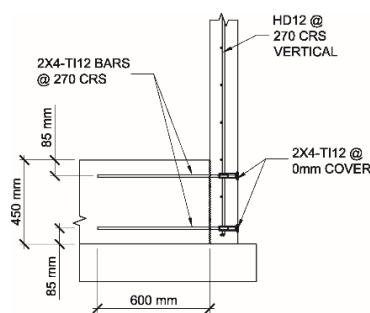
Detail of threaded insert embedded to panel back (Panel TI12-C0)
